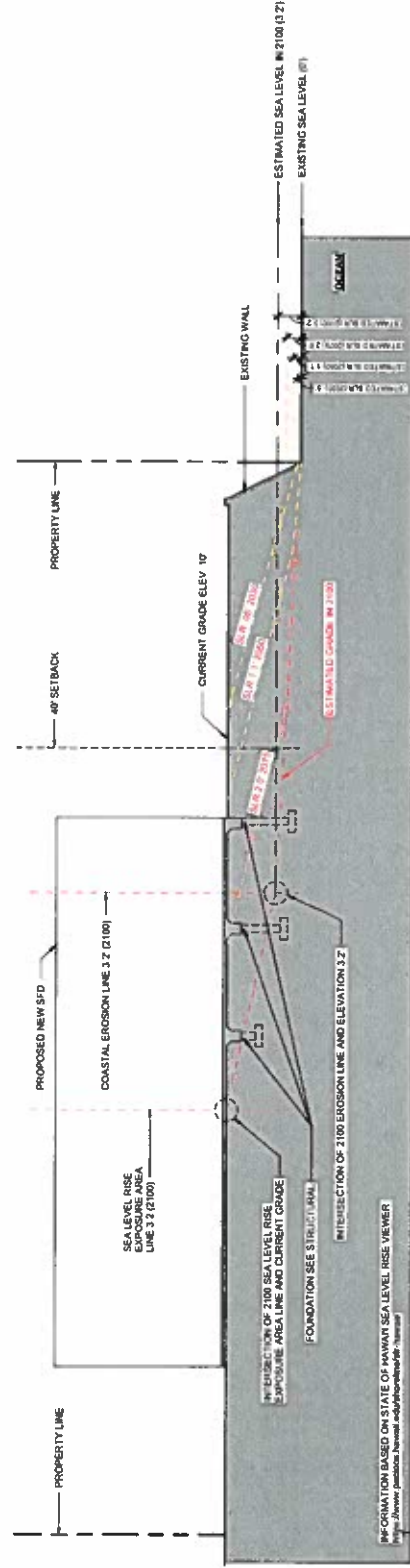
SITE SECTION AND BUILDING DIAGRAM
